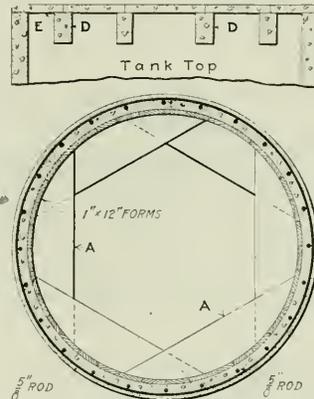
CONSTRUCTION OF CONCRETE STORAGE TANK
